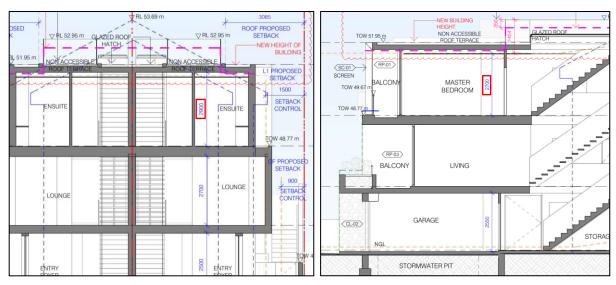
Section A – Part A and Section B through the building showing different floor to ceiling heights of the approved development, as proposed to be modified
